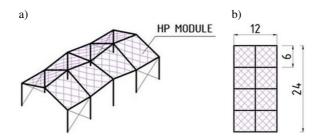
Diagram of the frame layout of a hall structure with a curvilinear modular roof: (a) axonometric view, (b) top view
